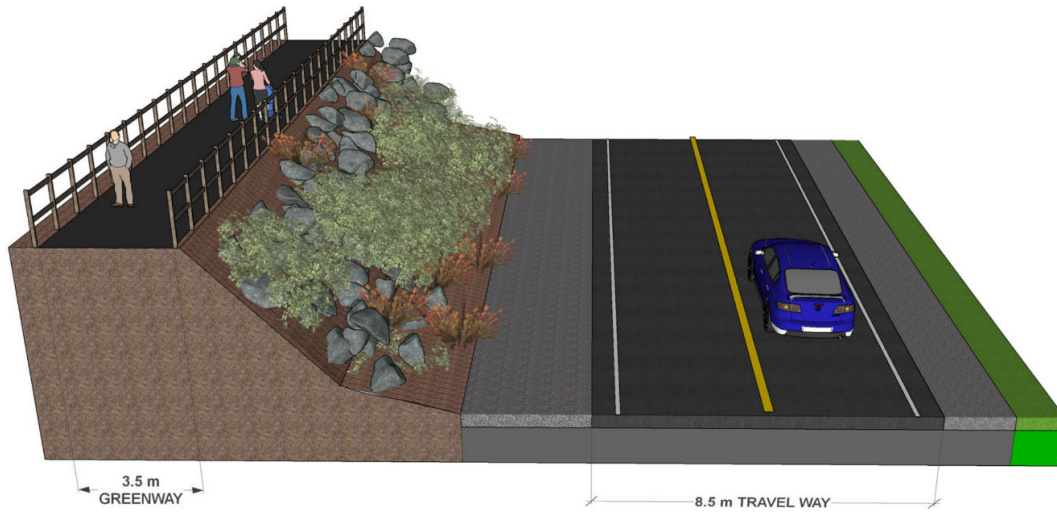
Typical Off-Road Greenway with Fencing Cross-Section
